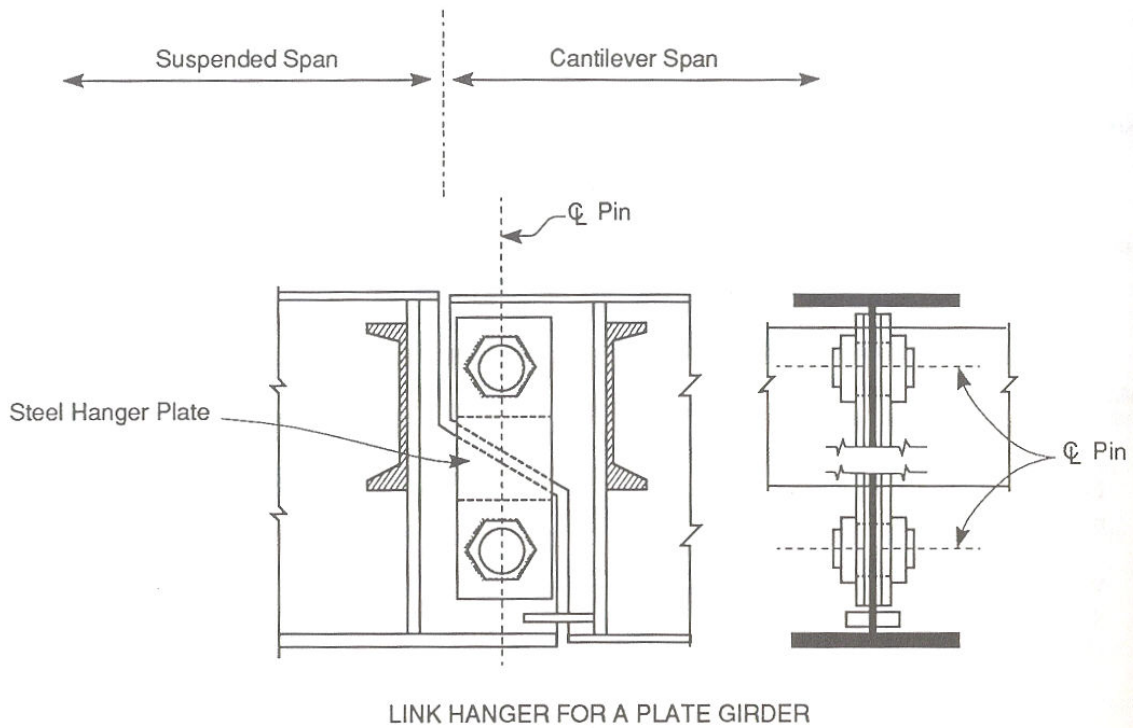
Pin and hanger assembly. Reprinted from Silano, *Bridge Inspection and Rehabilitation*. (New York 1993), p. 194.
